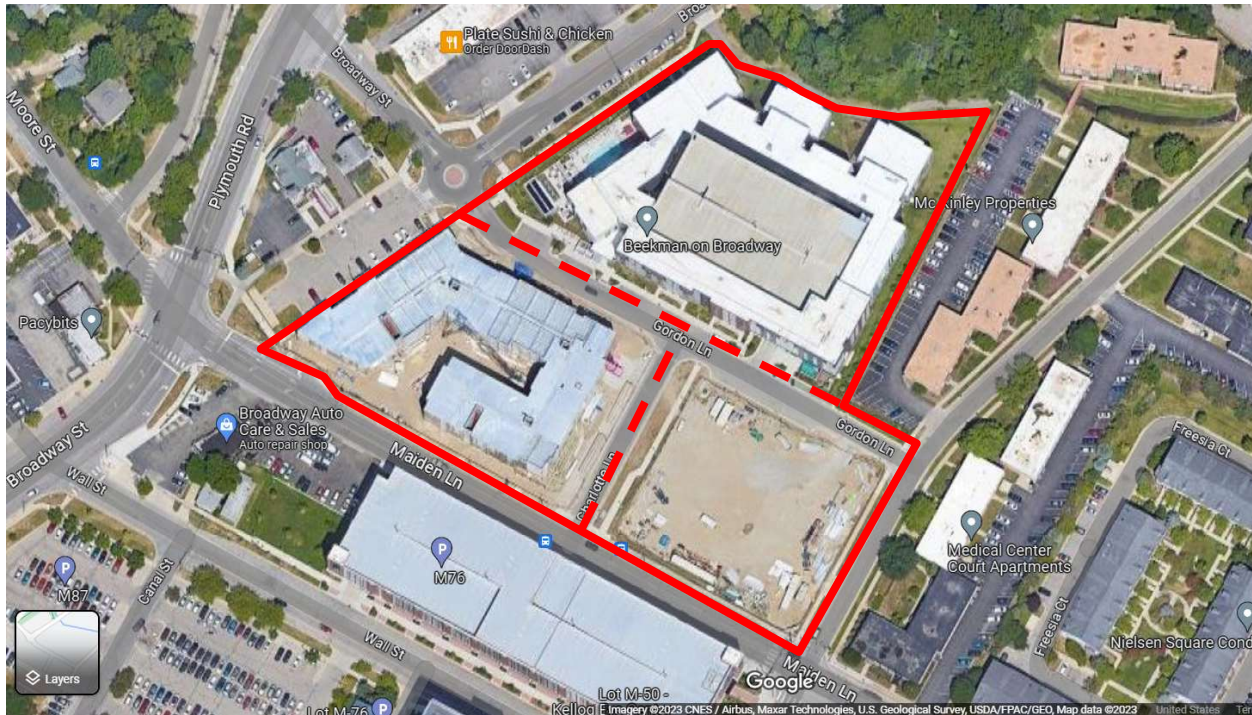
2023 Aerial Imagery of 1140 Broadway site
